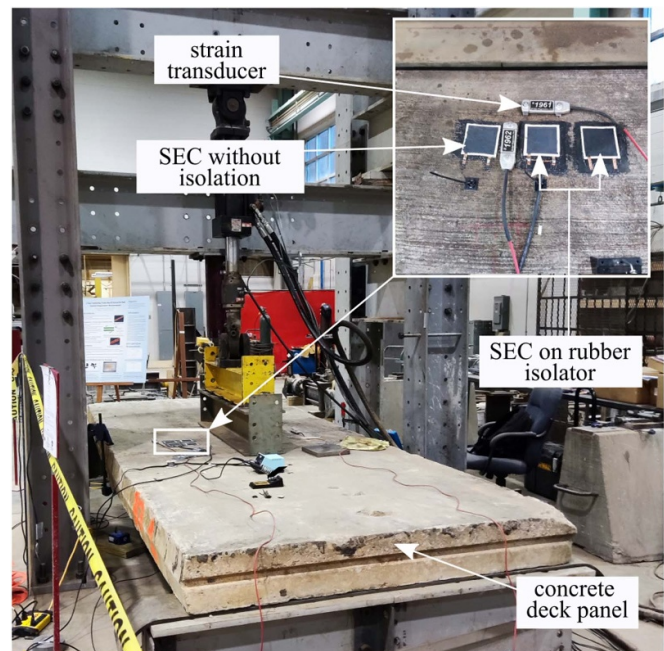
Experimental setup for full-scale reinforced concrete deck panel.
